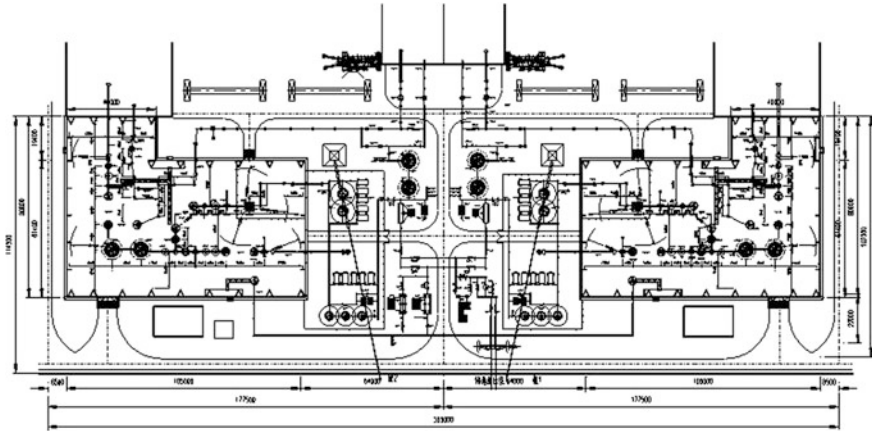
Arrangement of indoor DC switchyard in Zhundong station (mm)
